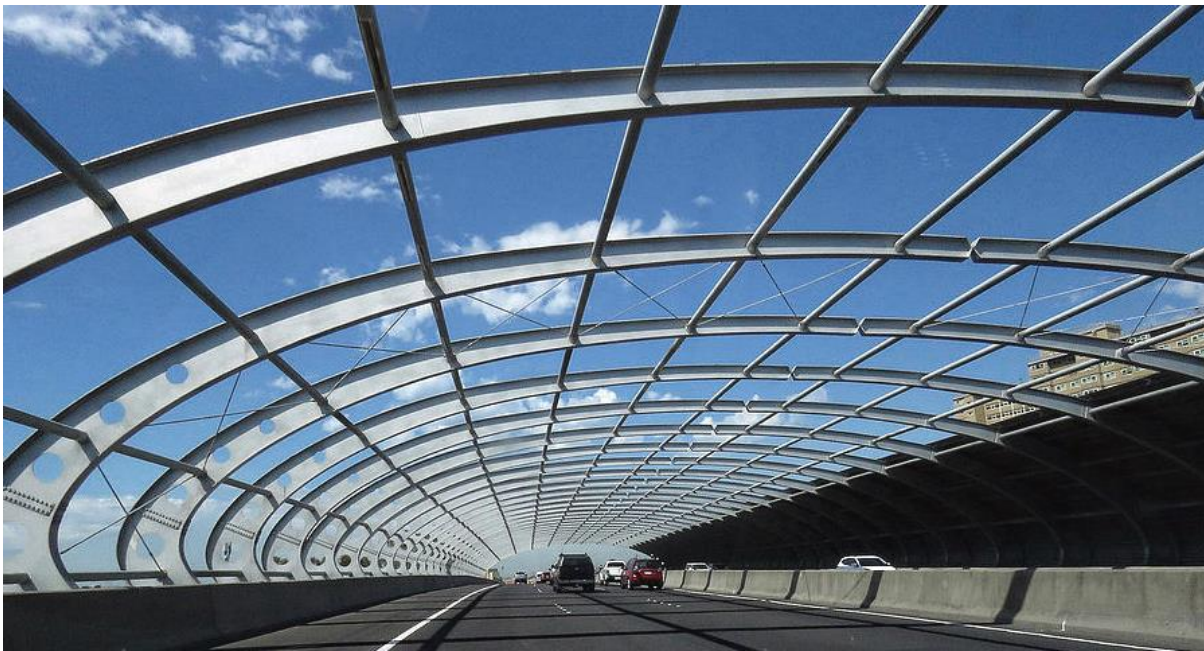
Examples of Noise Barriers built on Road Structures
